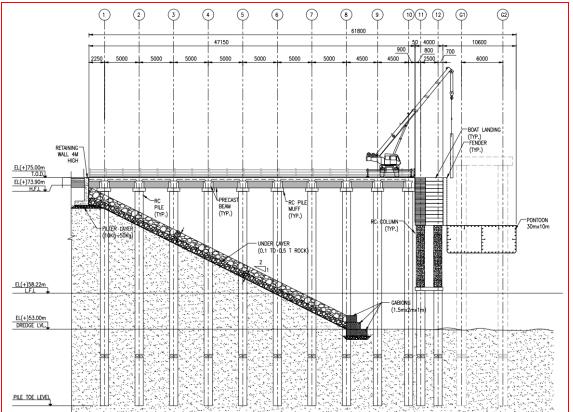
Longitudinal section of Berthing facility at High Flood level (+) 73.9m CD
